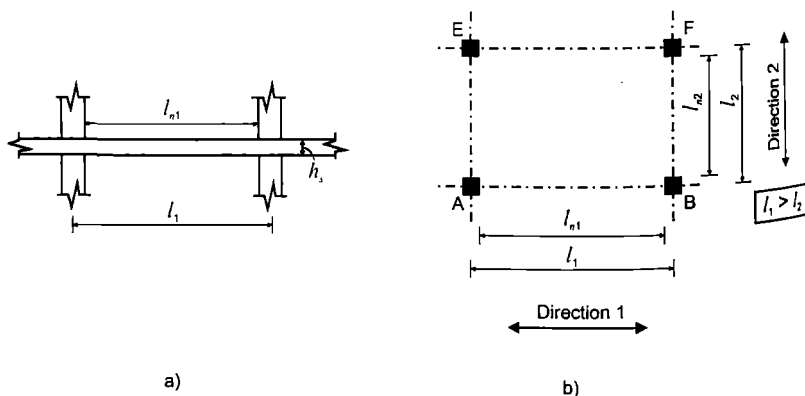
A typical two-way slab panel: a) elevation, and b) plan.
